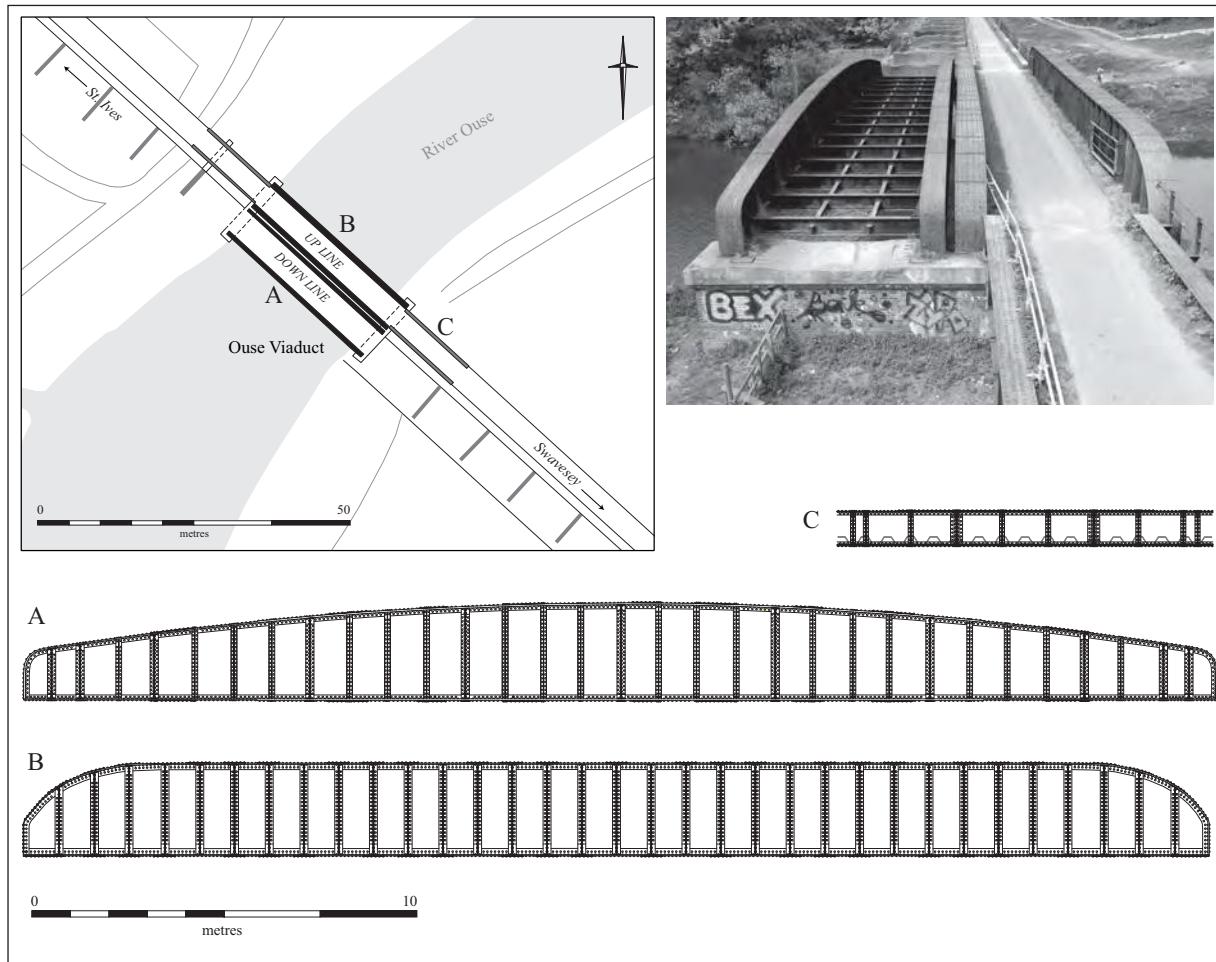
Great Ouse Viaduct: A. south facing elevation (external) of south river span; B. north facing elevation (external) of north river span; C. general elevation (internal) of flood spans on north track.
